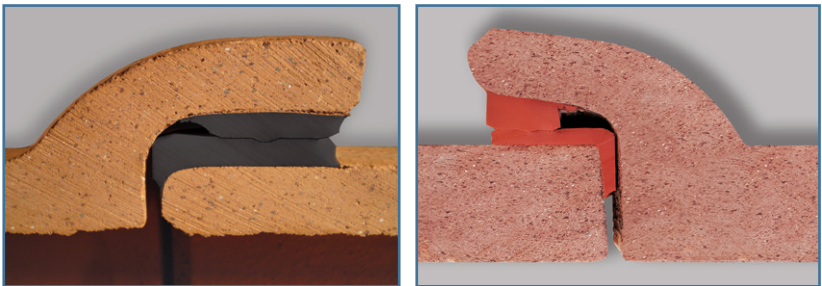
Vitrified Clay Pipe cross-sectional compression joint designs for Bell & Spigot pipe. Note the trim/ chamfer on the spigot and bell ends, as well as the "gap" on the fully homed joint.
